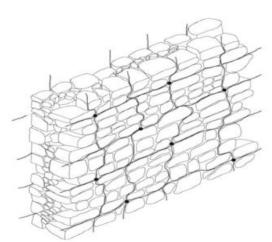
Wall strengthened with 'Reticolatus' (Borriet al 2014).
